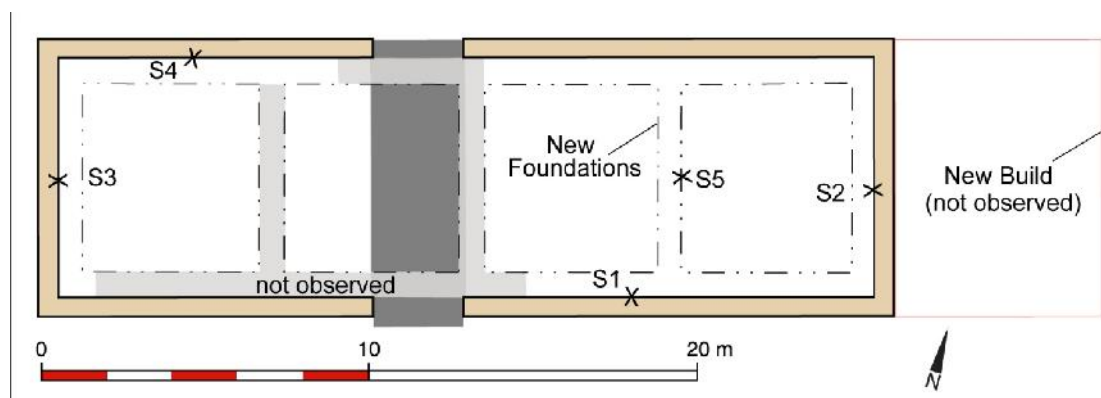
Plan of Building 5 showing layout of new foundation trenches and location of recorded sections (S1 – 5).
